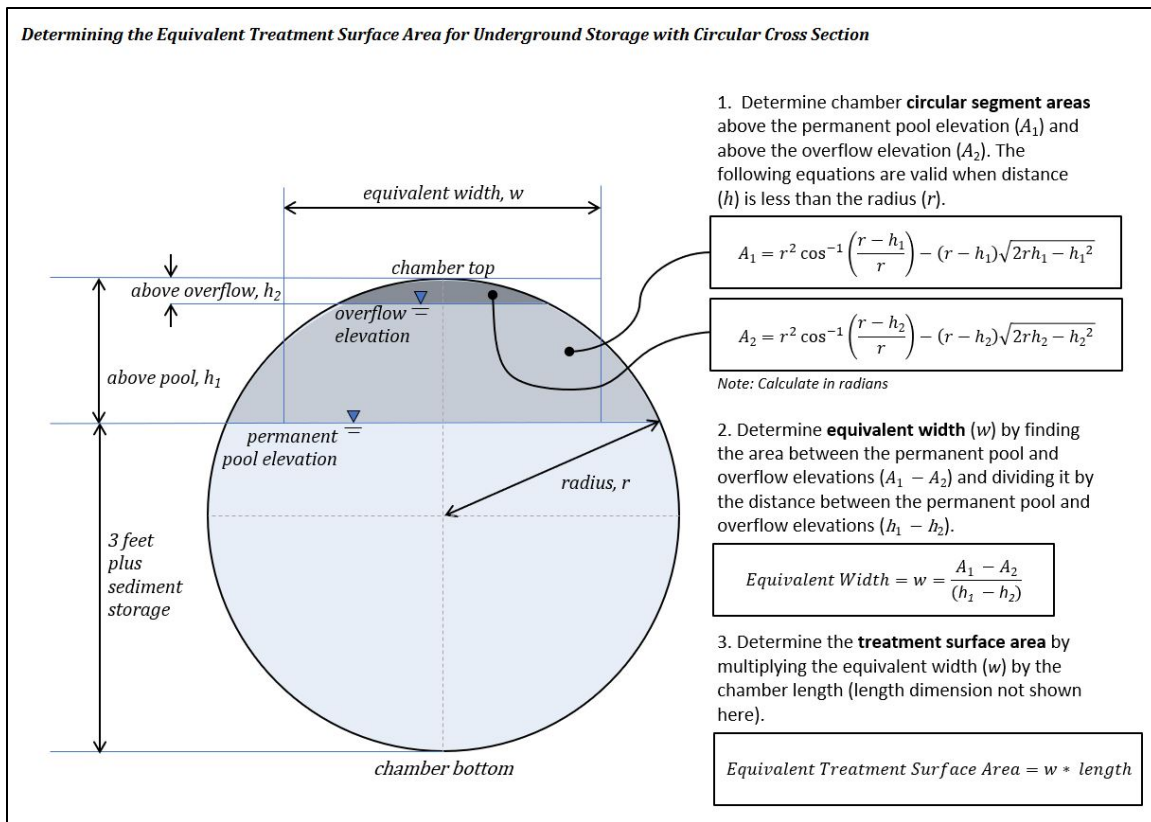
(Determining the Equivalent Treatment Surface Area for Underground Settling with Circular Cross-Section)
